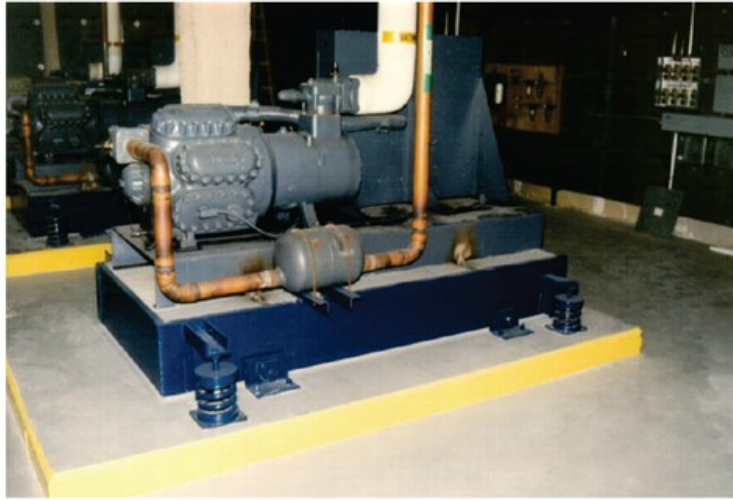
Open springs and snubbers used to support equipment (Photo courtesy of Mason Industries).
